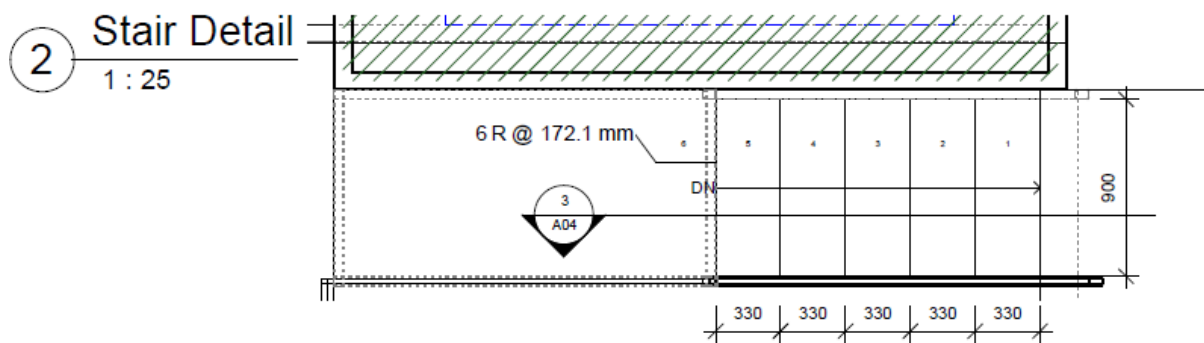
| Details of the proposed stairs (Source: Applicant's documentation)
